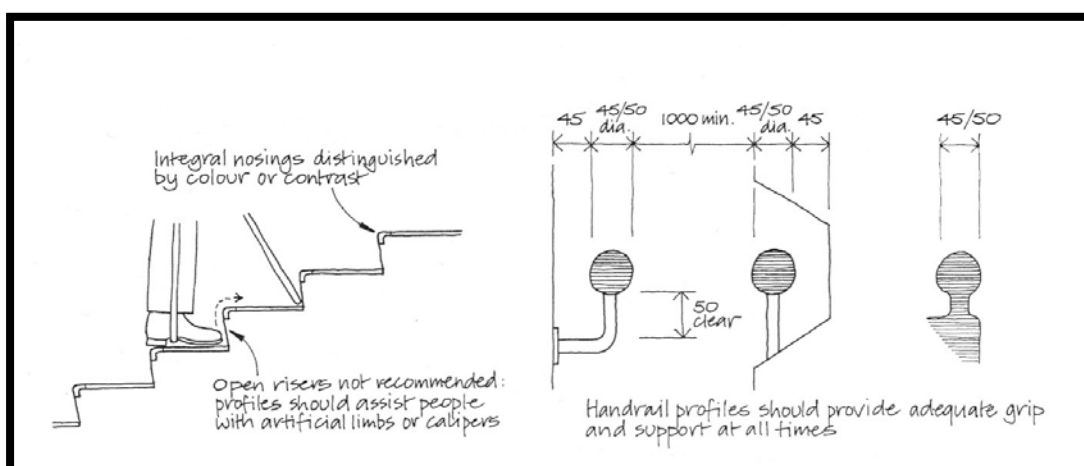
Stairs noises and handrail scale (Wood, 1999, p. 17)
